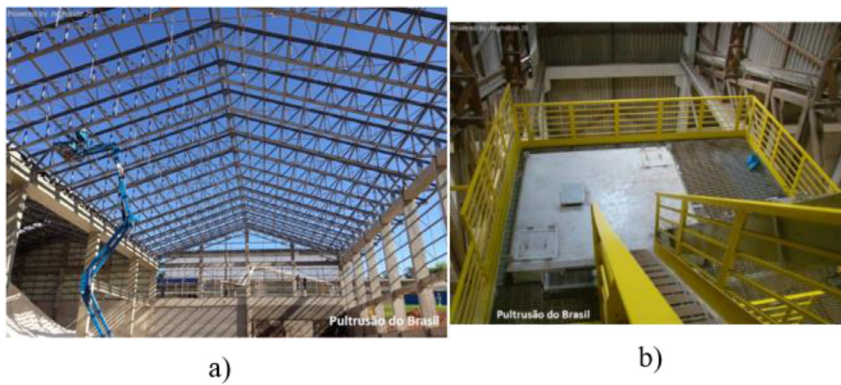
Examples of pultruded structures: (a) elements of an industrial shed, (b) stairs, guardrail and floor grid (Pultrusão do, 2020).
